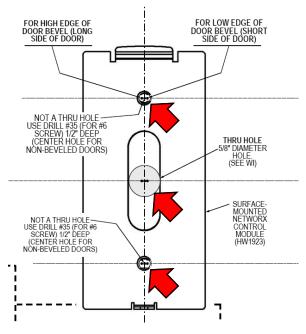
MARK THE TWO "CONTROL UNIT MOUNTING PLATE" HOLES (ARROWS)
